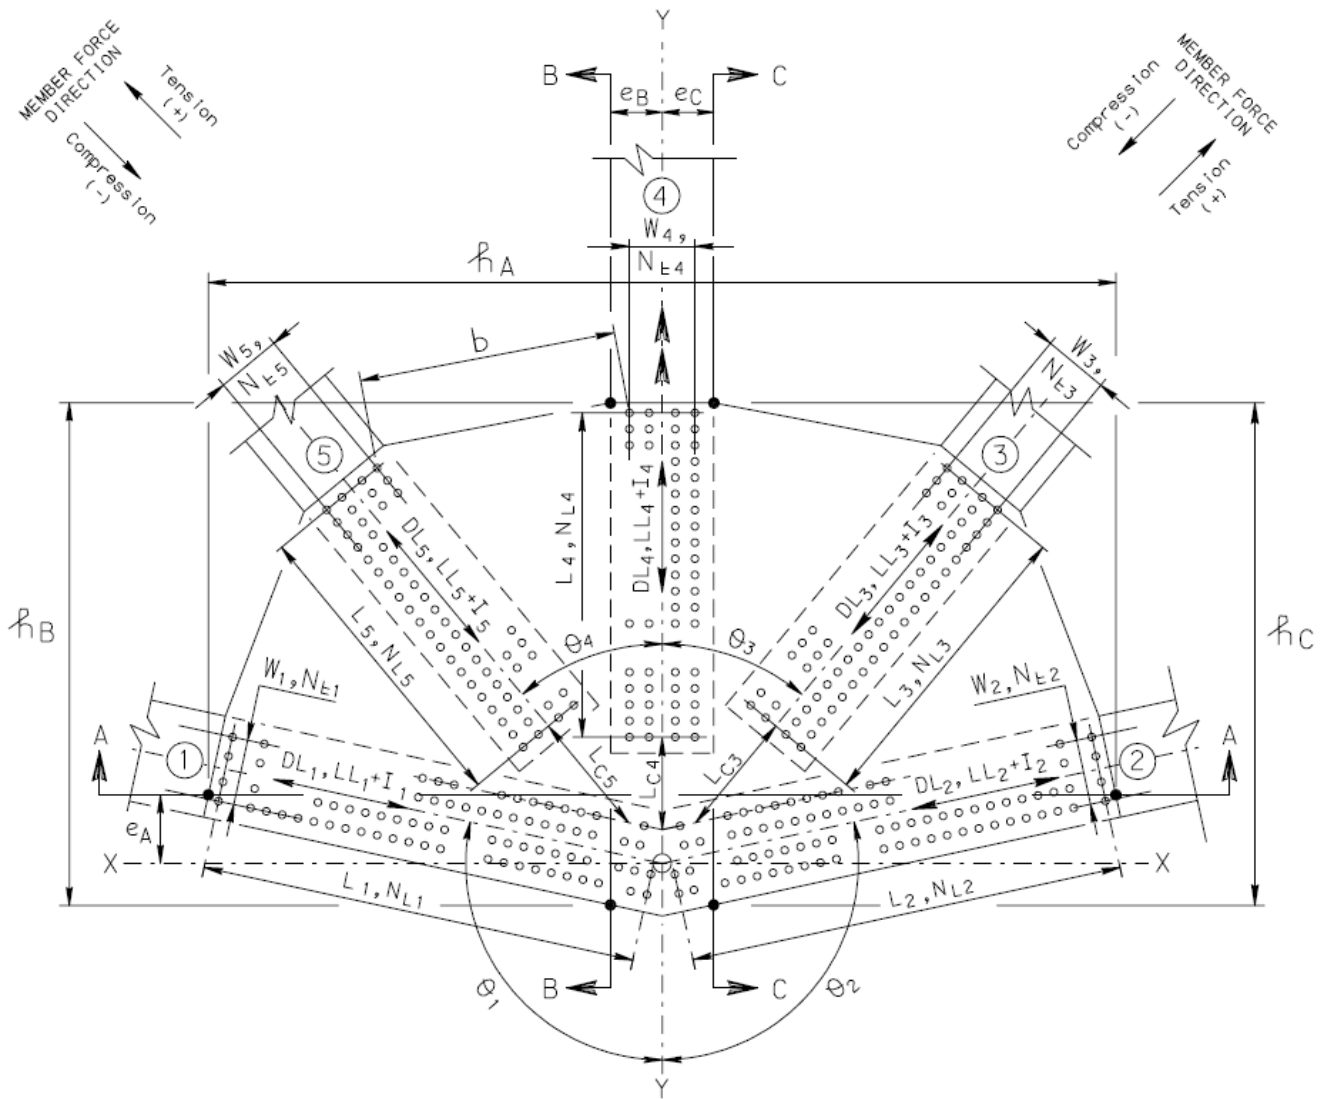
Gusset Plate Geometry: Angled Lower Chord
